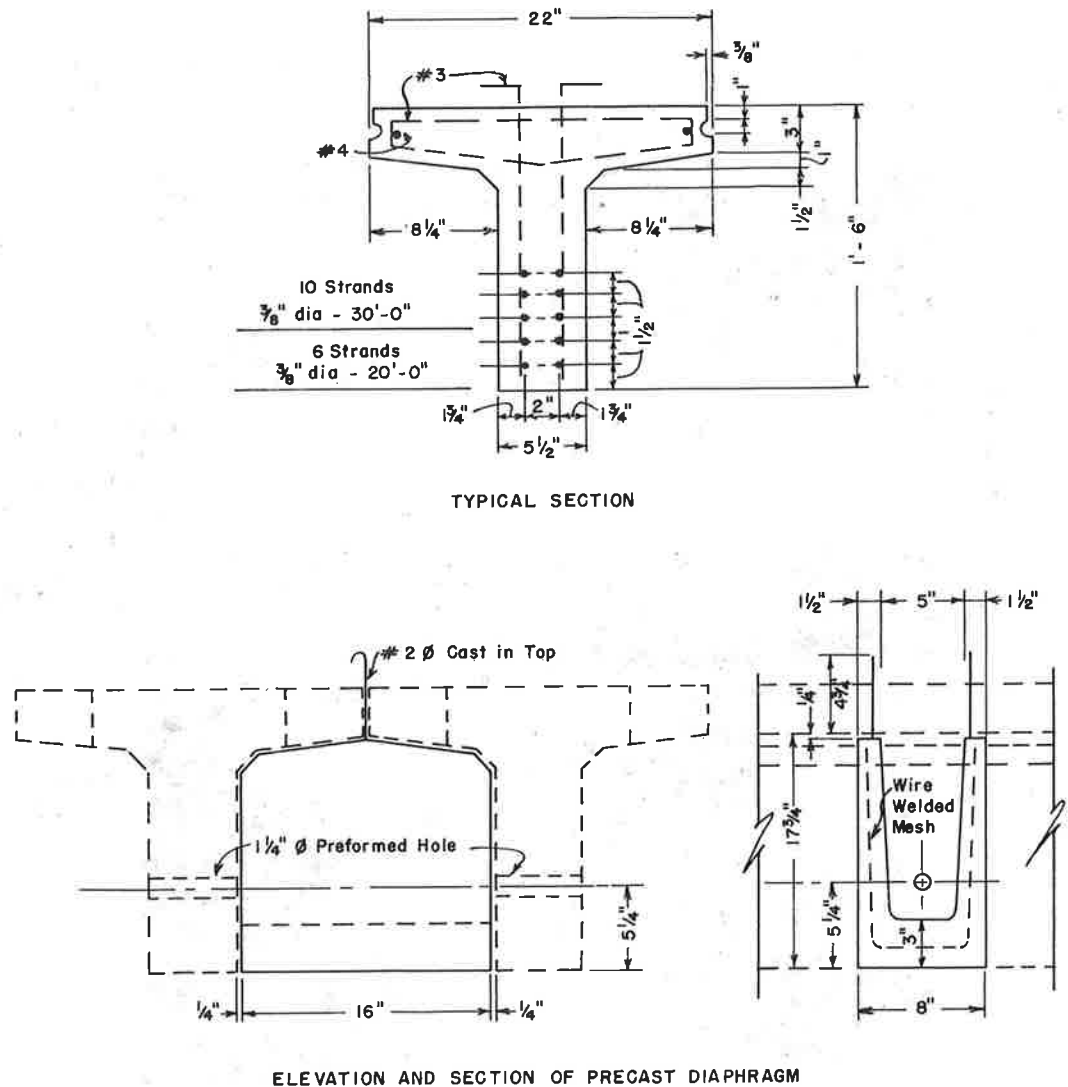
Typical cross-section of prestressed concrete T beam, Sweet Briar Ave Bridge, Trenton, N.J.
